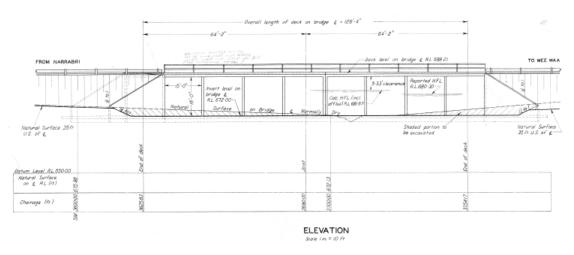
Elevation of Spring Creek Culvert (Source: WAE drawings)
